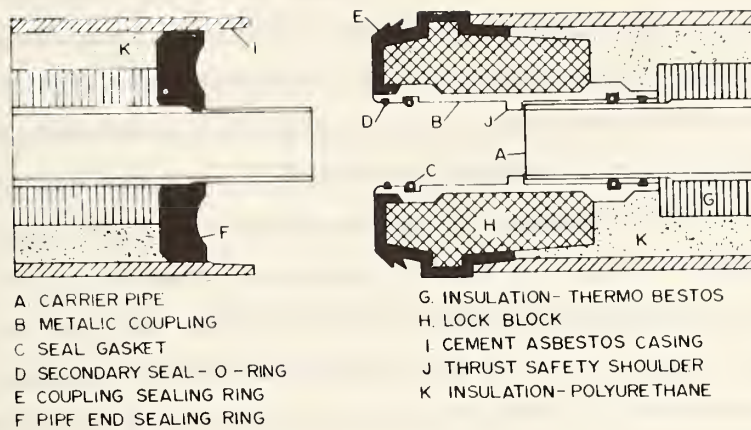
Sealed conduit system with non-welded joint.
